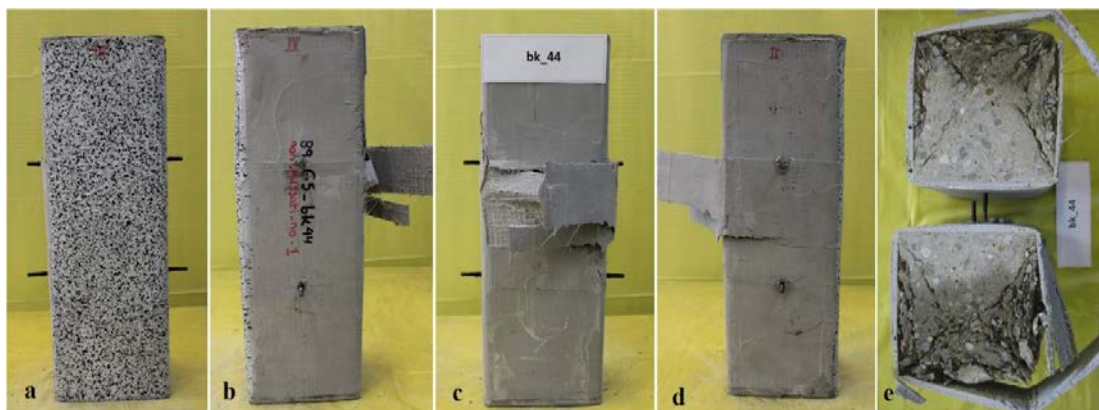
Failure mode of steel-FRP confined specimen (specimen SQ-450-HD-CE-UT-S-1L-1 shown): (a) front face; (b) right face; (c) back face; (d) left face; (e) cut section.
